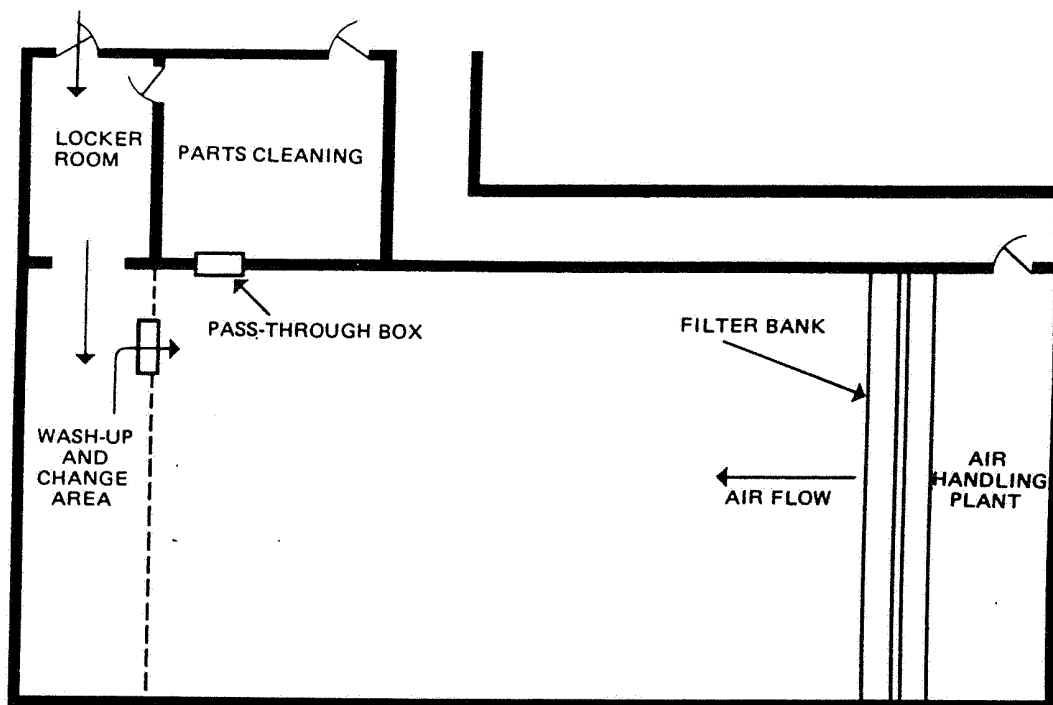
LAYOUT OF A TYPICAL CONVENTIONAL CLEAN ROOM
